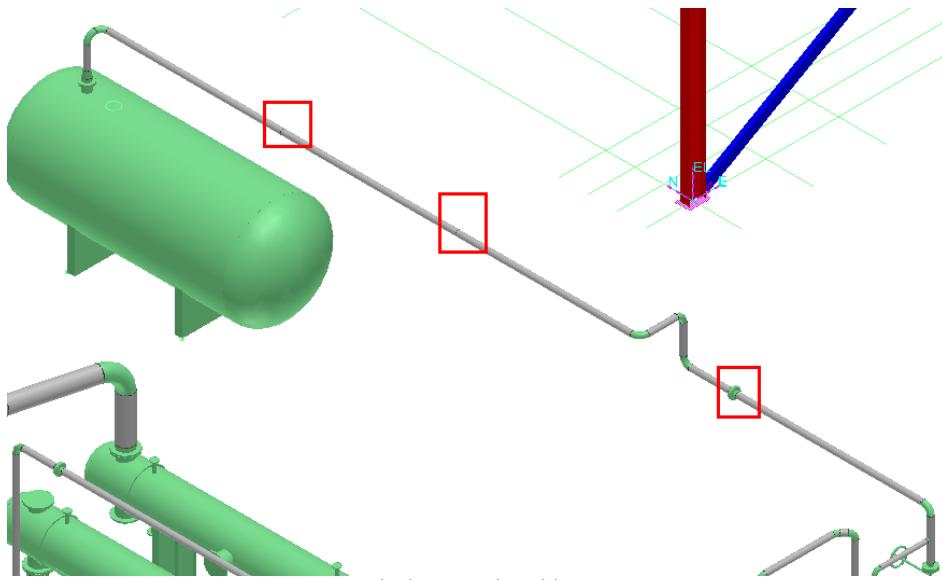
Takedown and Weld Joints in a Pipe Run
